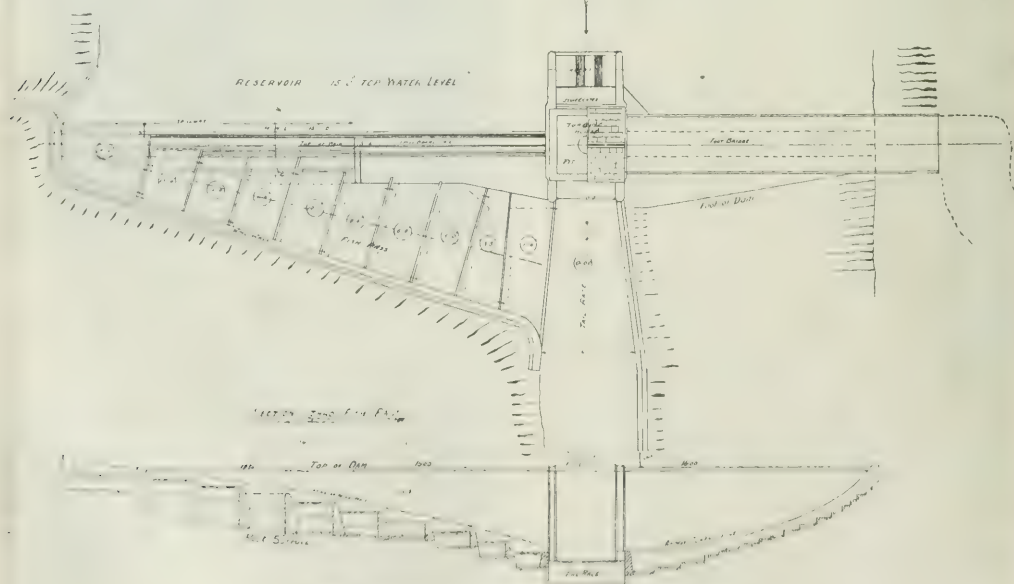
PLAN AND ELEVATION OF DAM AND FISH PASS.
